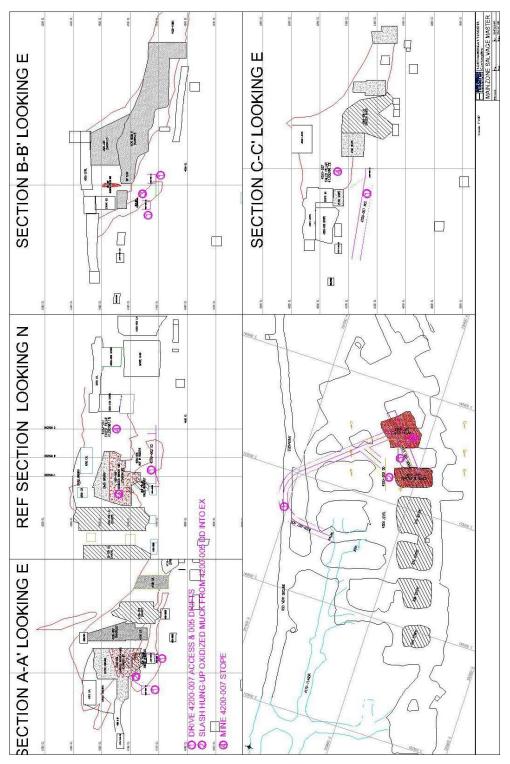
UPPER MAIN ZONE MINE PLAN
